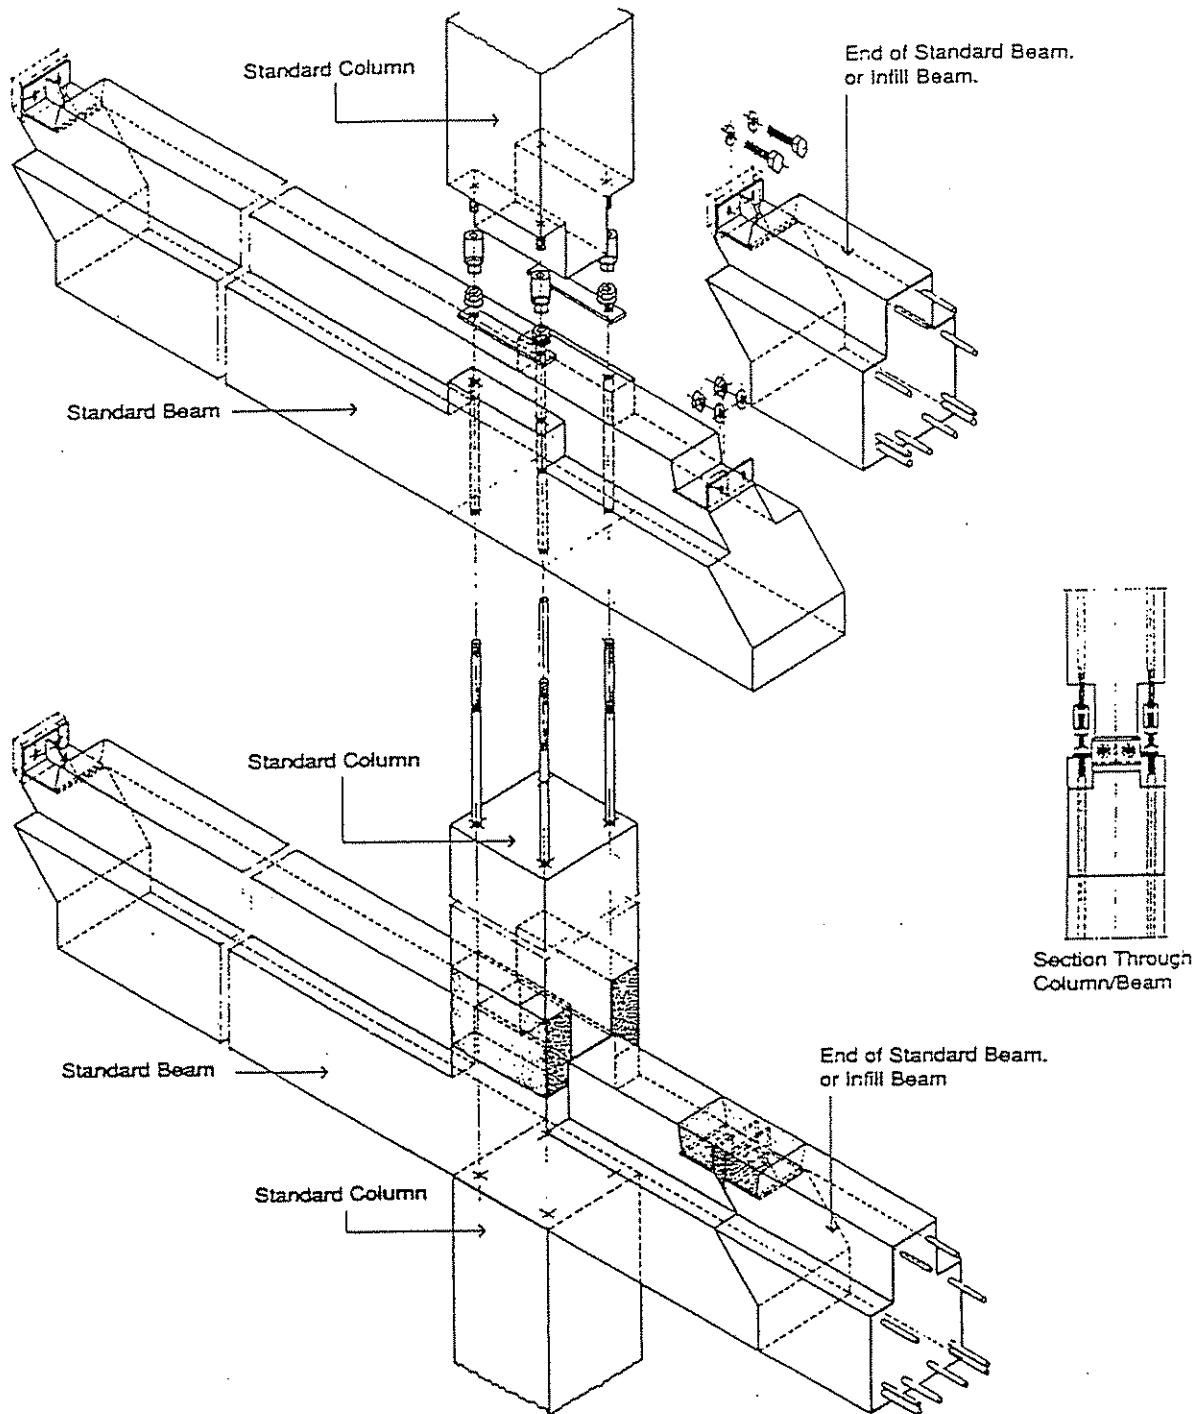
Beam-to-column connection and bolted beam-to-beam mechanical connection [adapted from Contiframe Structures 1992].
